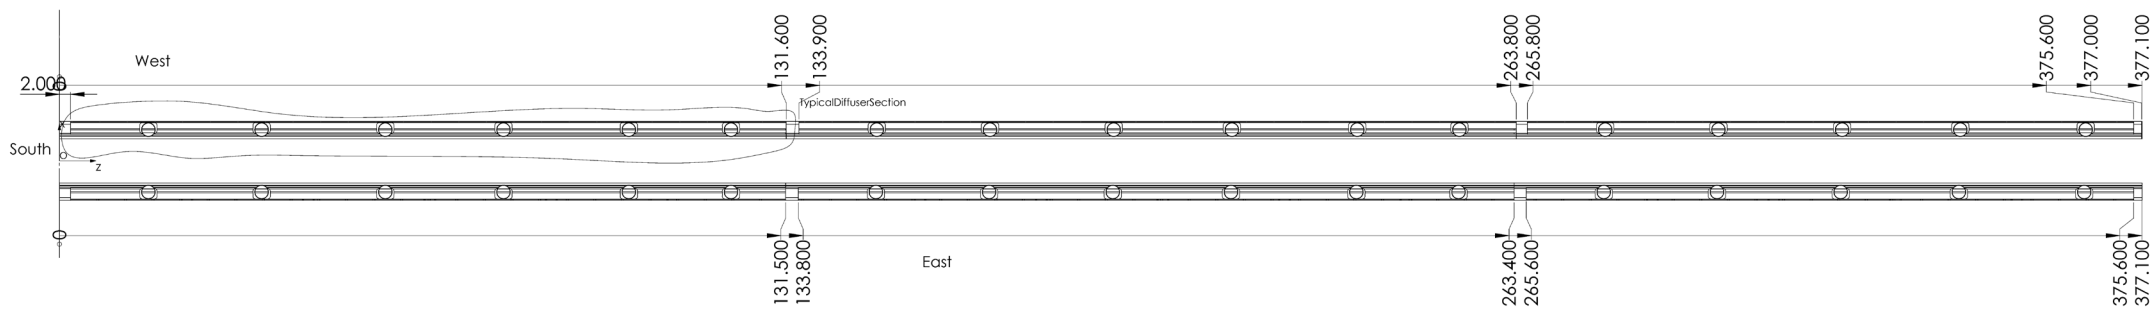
2D Drawing of west and east diffuser sections. End cap locations. Dimensions in inches.
